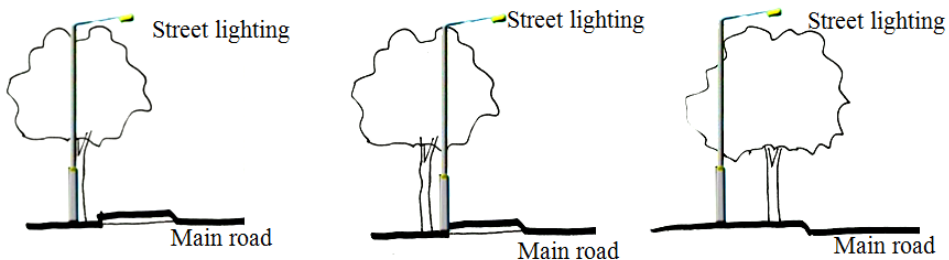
Type of pedestrian walkway with streetscape element; c) In line with street planting, d) Near to pedestrian walkways, e) Behind of street planting
